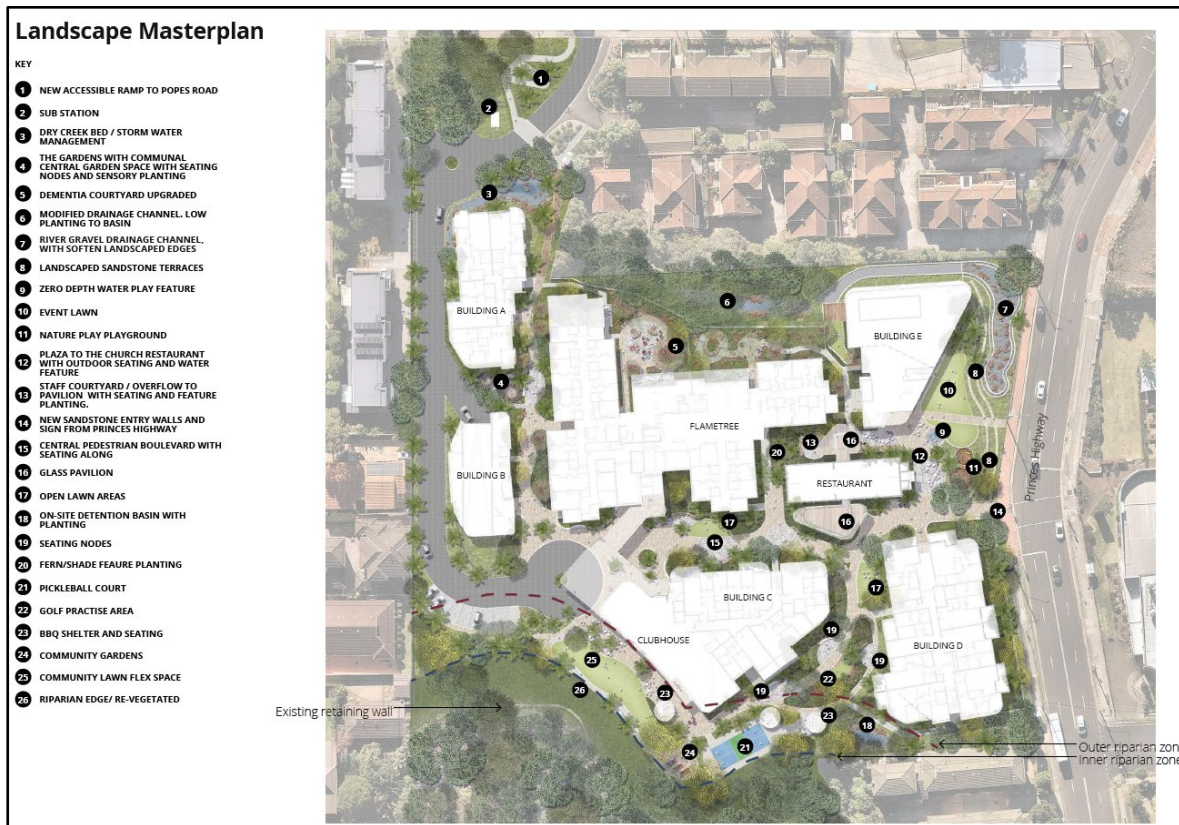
EXCERPT OF LANDSCAPE MASTERPLAN (ARCADIA)
